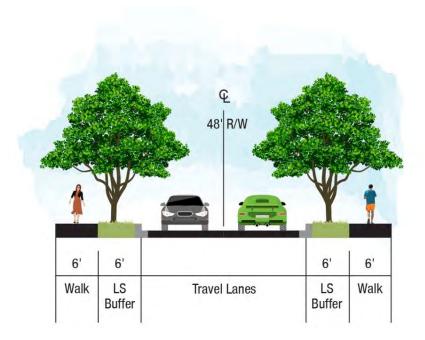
LOCAL STREET STREETSCAPE - NO ON-STREET PARKING
